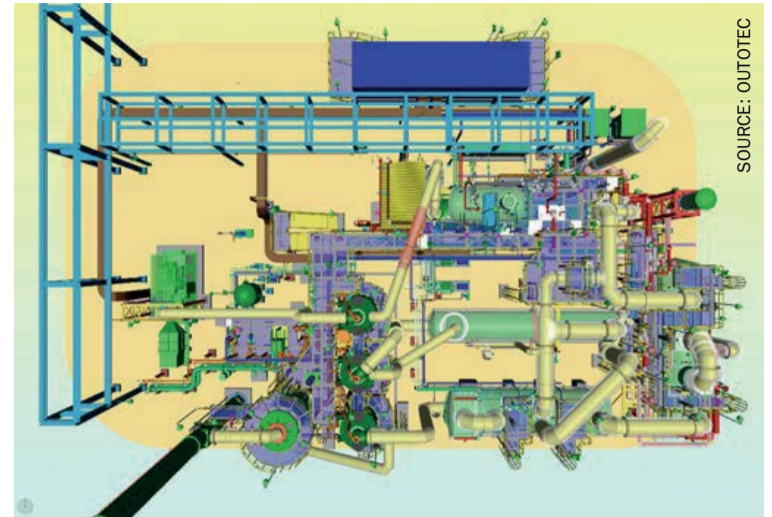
SAP250M modular acid plant (30 m x 42 m) – plant layout.
